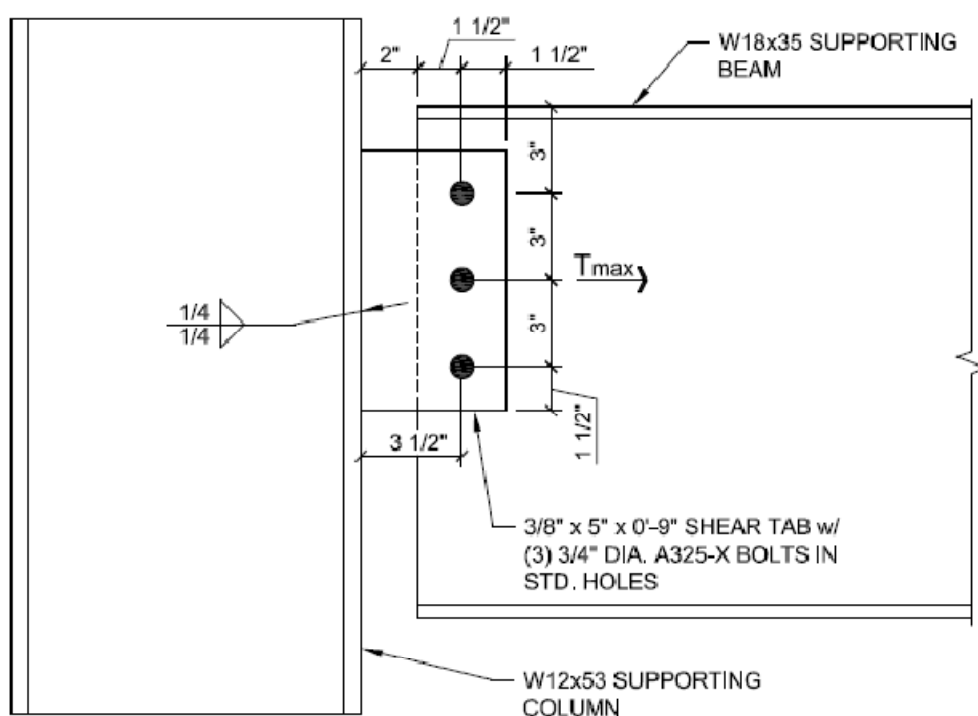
Typical Three Bolt Shear Tab Connection Configuration – Tension Case.
